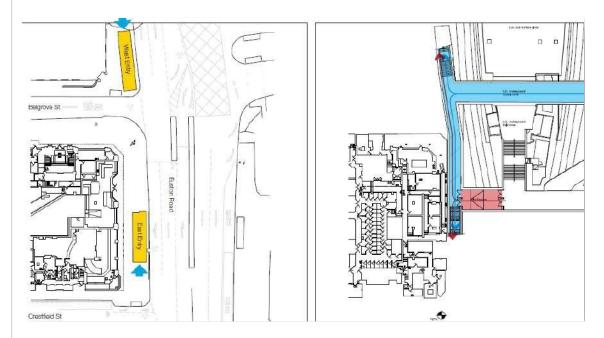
Existing London Underground - Ground Floor and Basement plans
